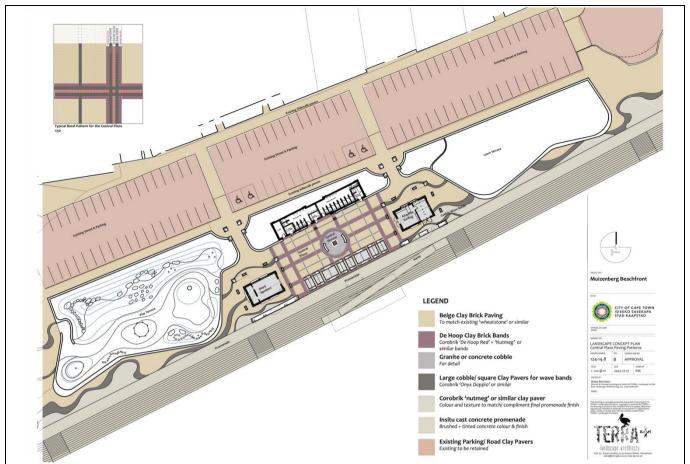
Proposed paving patterns of the central plaza area. Refer to Appendix B1.6 for a larger-scale drawing.
